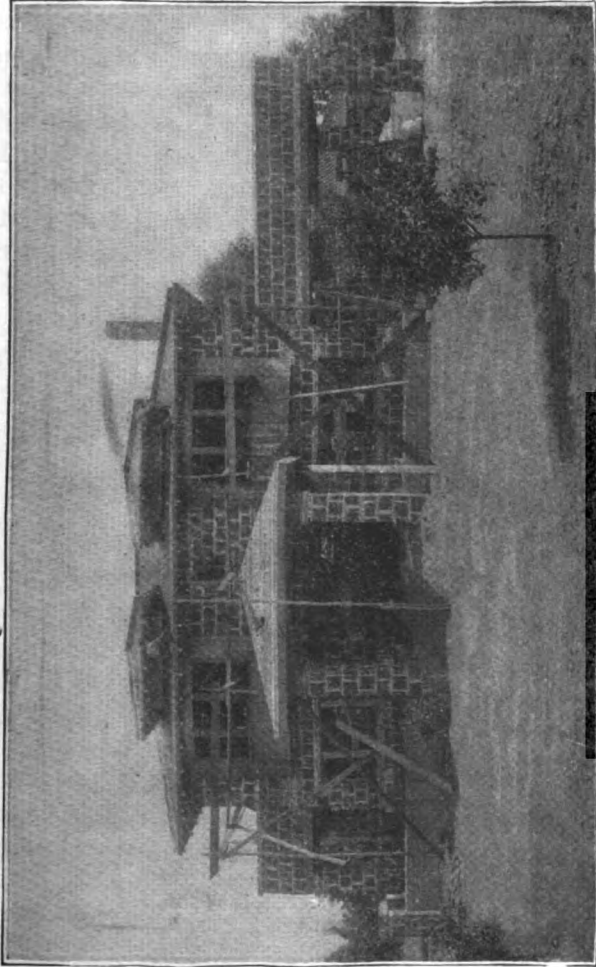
Hollow building tile used in wall construction. Cut by courtesy of Simons Brick Co.
